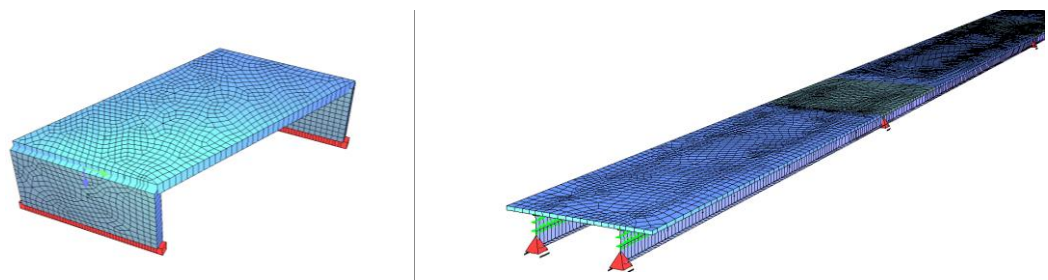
SOFiSTiK bridge models of frame bridge (left) and composite bridge (right)
